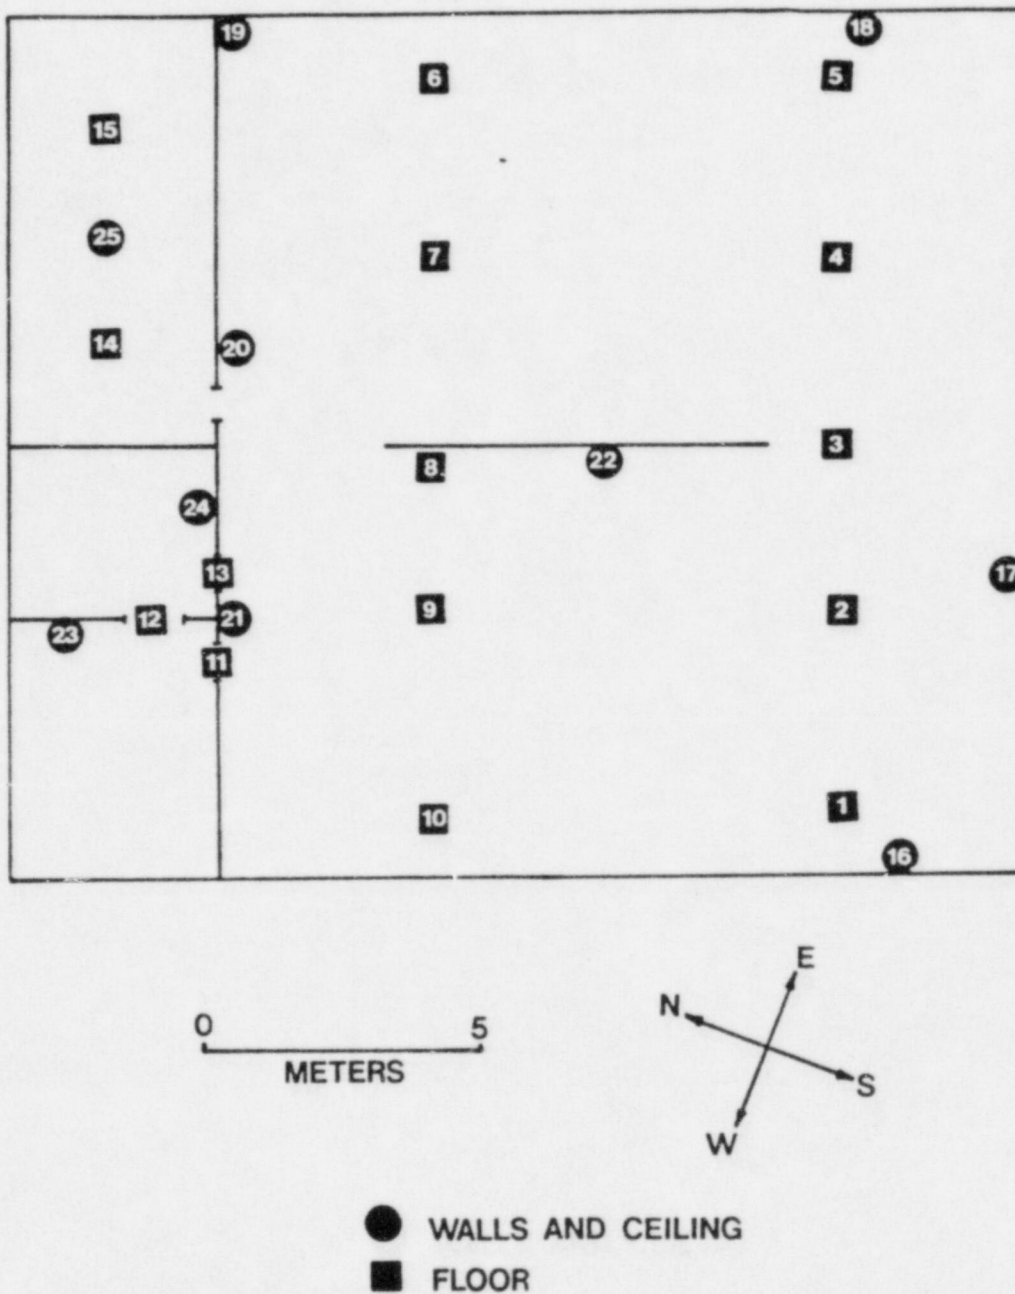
Floor Plan of the Maintenance II Building Indicating Locations of Measurements and Smears
